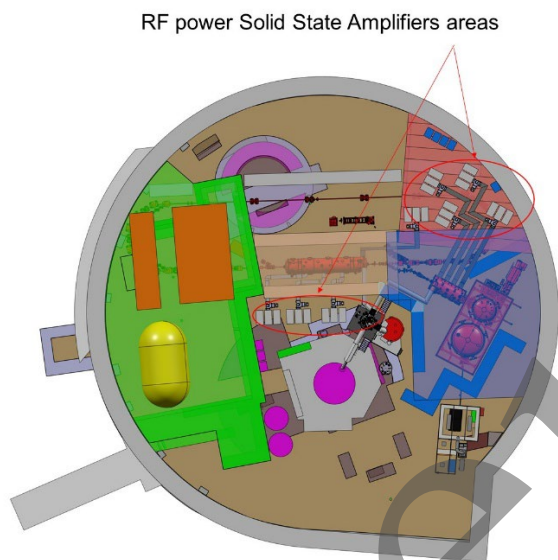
Floor Plan of the IGLOO building, which houses PERLE.
